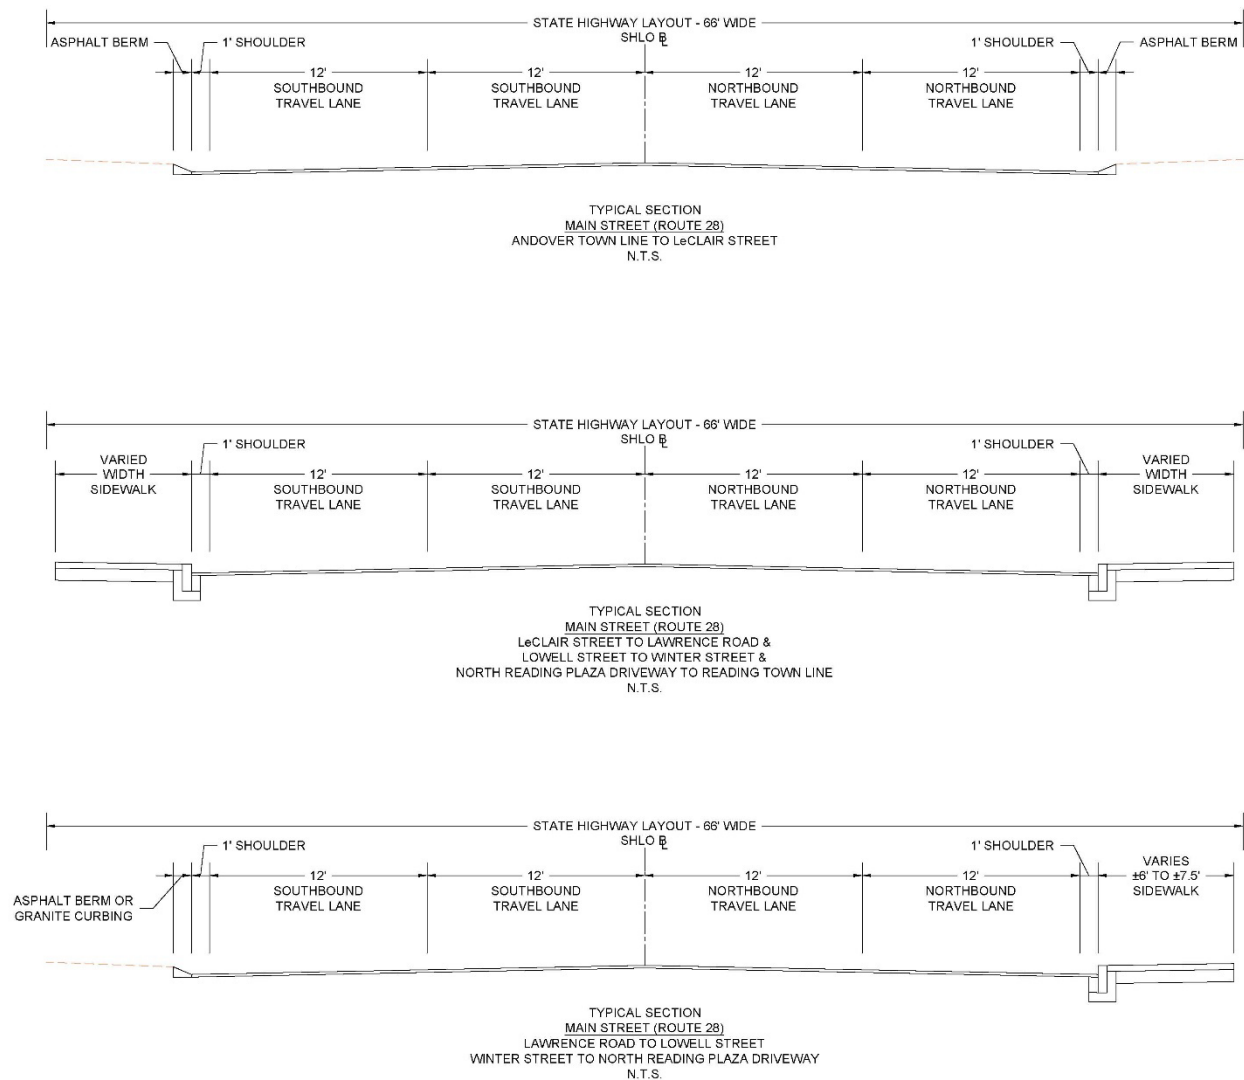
Typical Cross-Sections of Main Street from Andover Town Line to Reading Town Line
